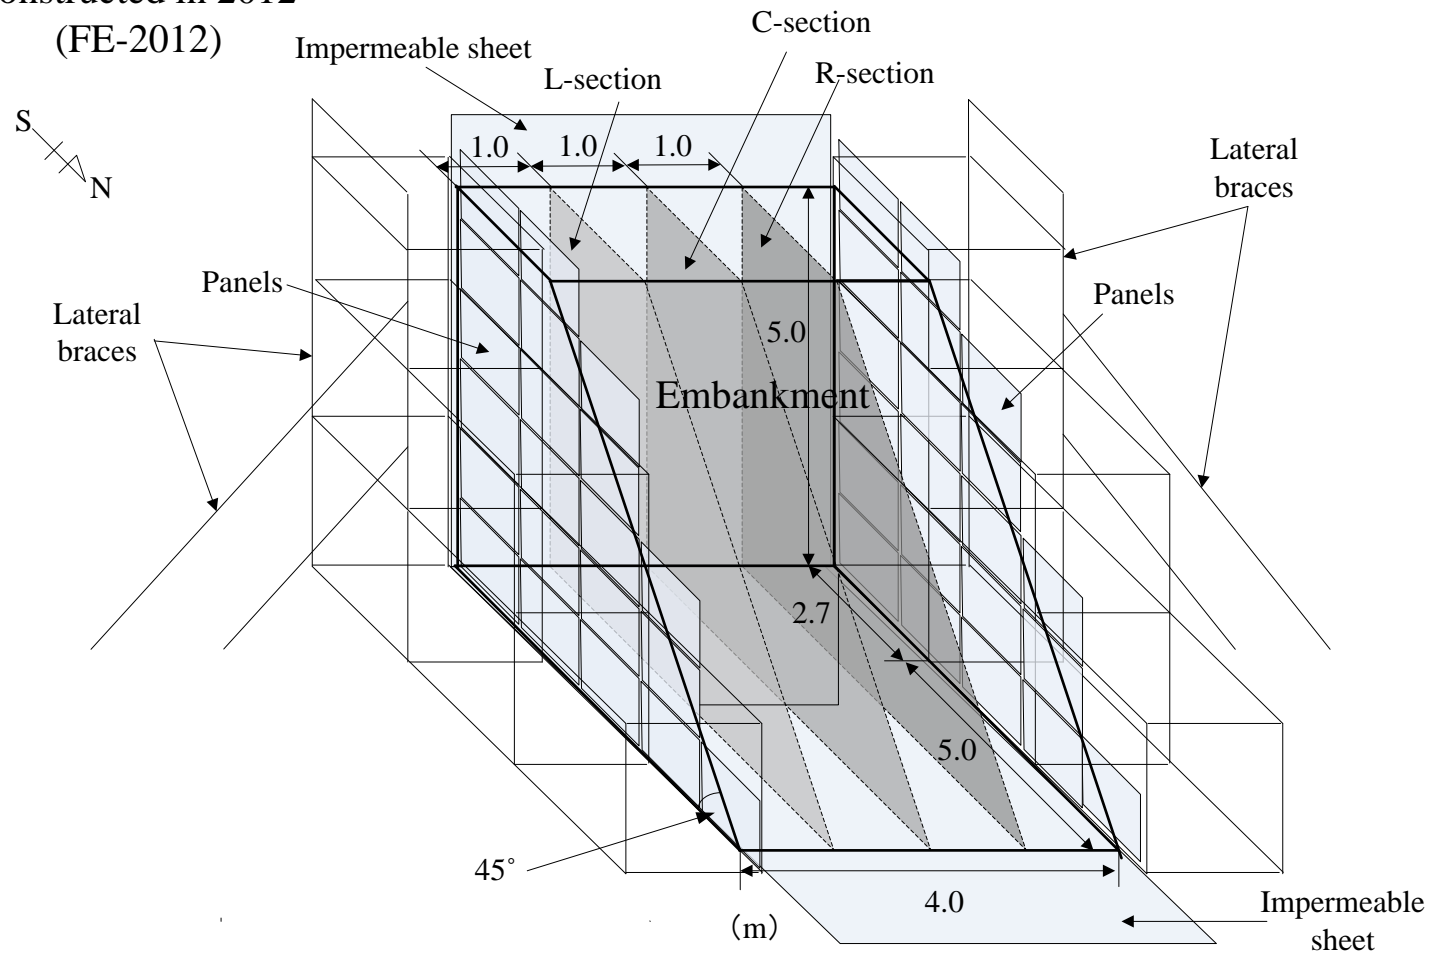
Schematic diagram of full-scale embankment constructed in 2012, FE-2012
